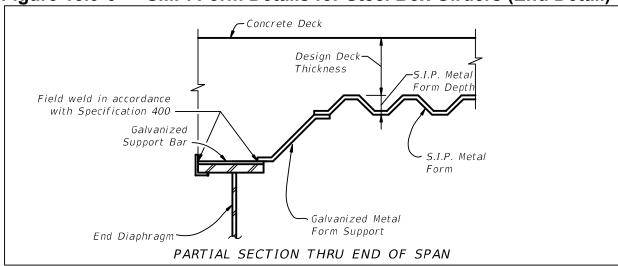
S.I.P. Form Details for Steel Box Girders (End Detail)
